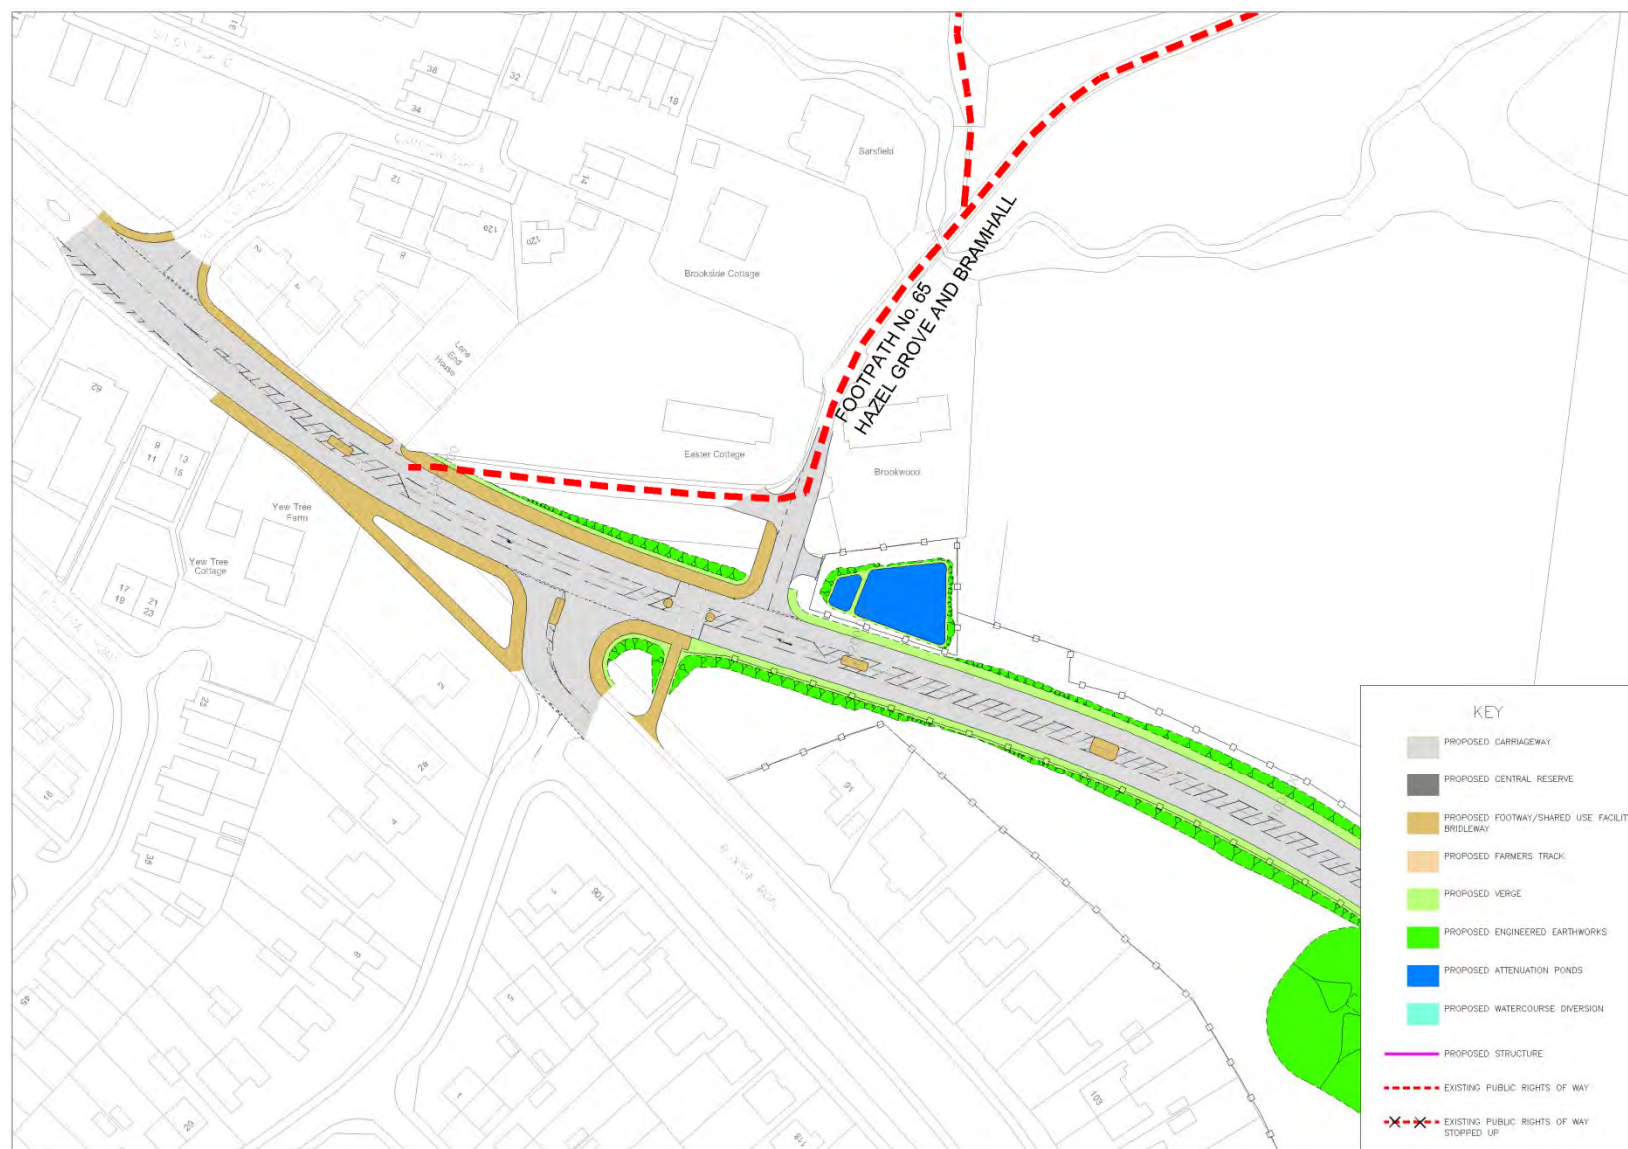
Proposed Highway Route: Hazel Grove east (A6 Buxton Road) – Realigned A6/ Buxton Road (Eastern Tie-in Junction)
